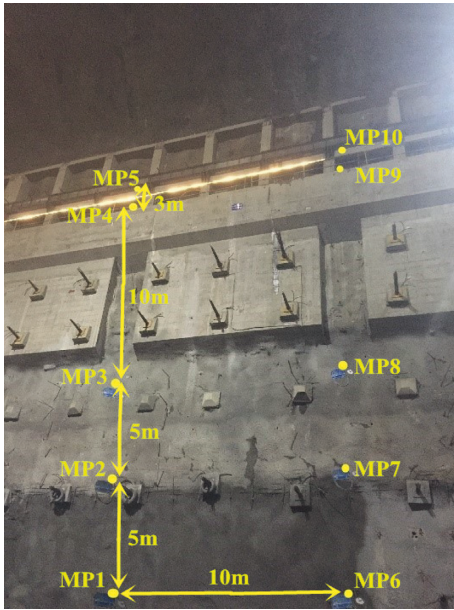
Instrument layout for the blasting vibration test of high side wall of the powerhouse.
